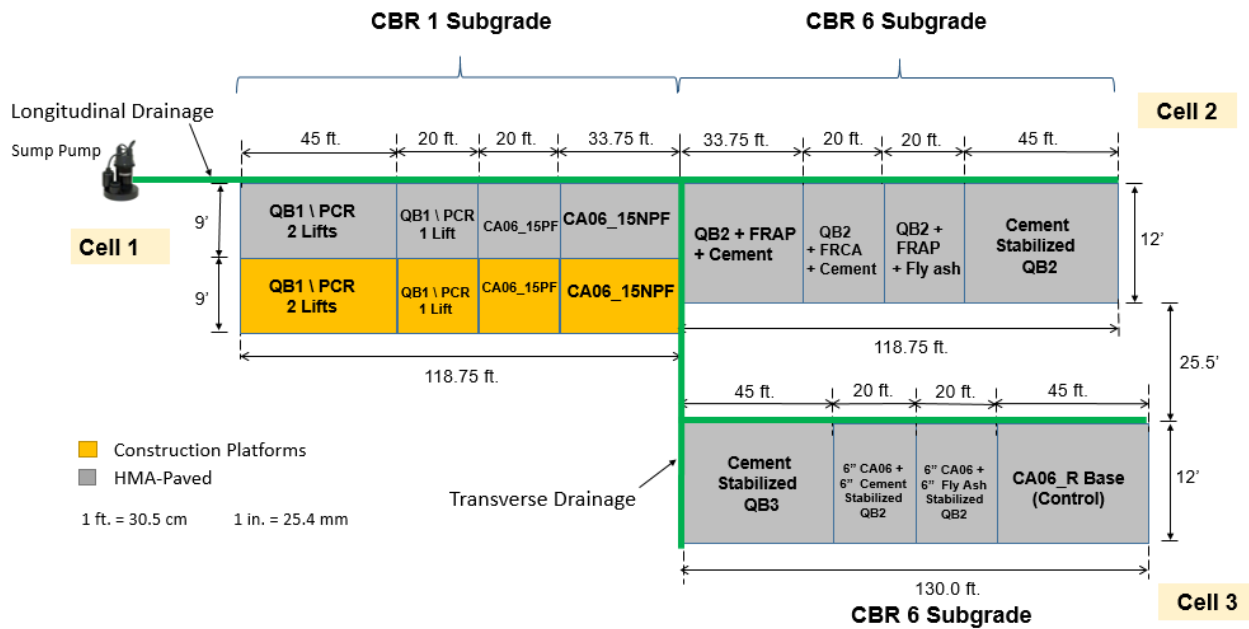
Plan view of the constructed test sections encompassing different QB applications
